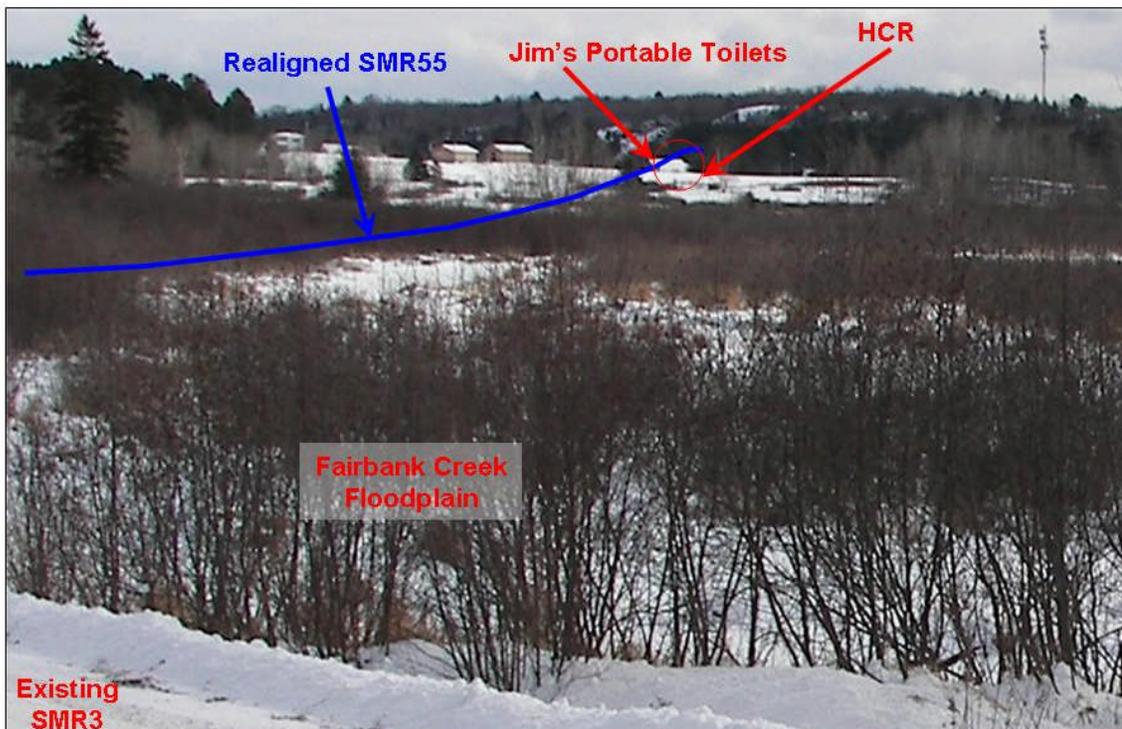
VIEW: Looking south from driveway of 228 SMR3 across existing Fairbank Creek at site of new structure. Extensive floodplain in midground past road. (Dec. 6, 2007)
